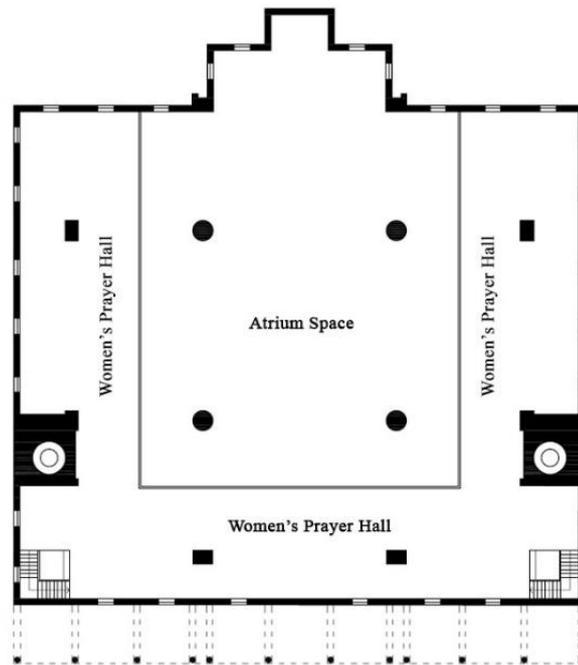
Haciveyiszade Mosque, mezzanine floor plan
